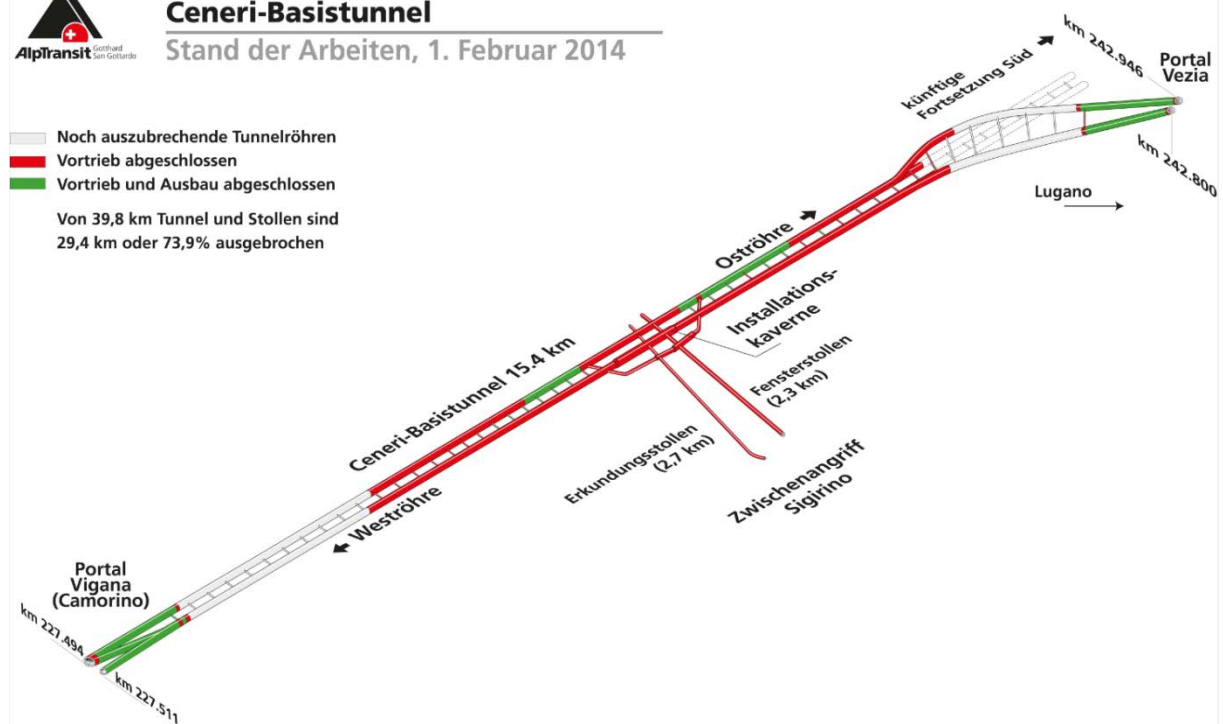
Drilling works at Ceneri Tunnel (31.12.2013)
